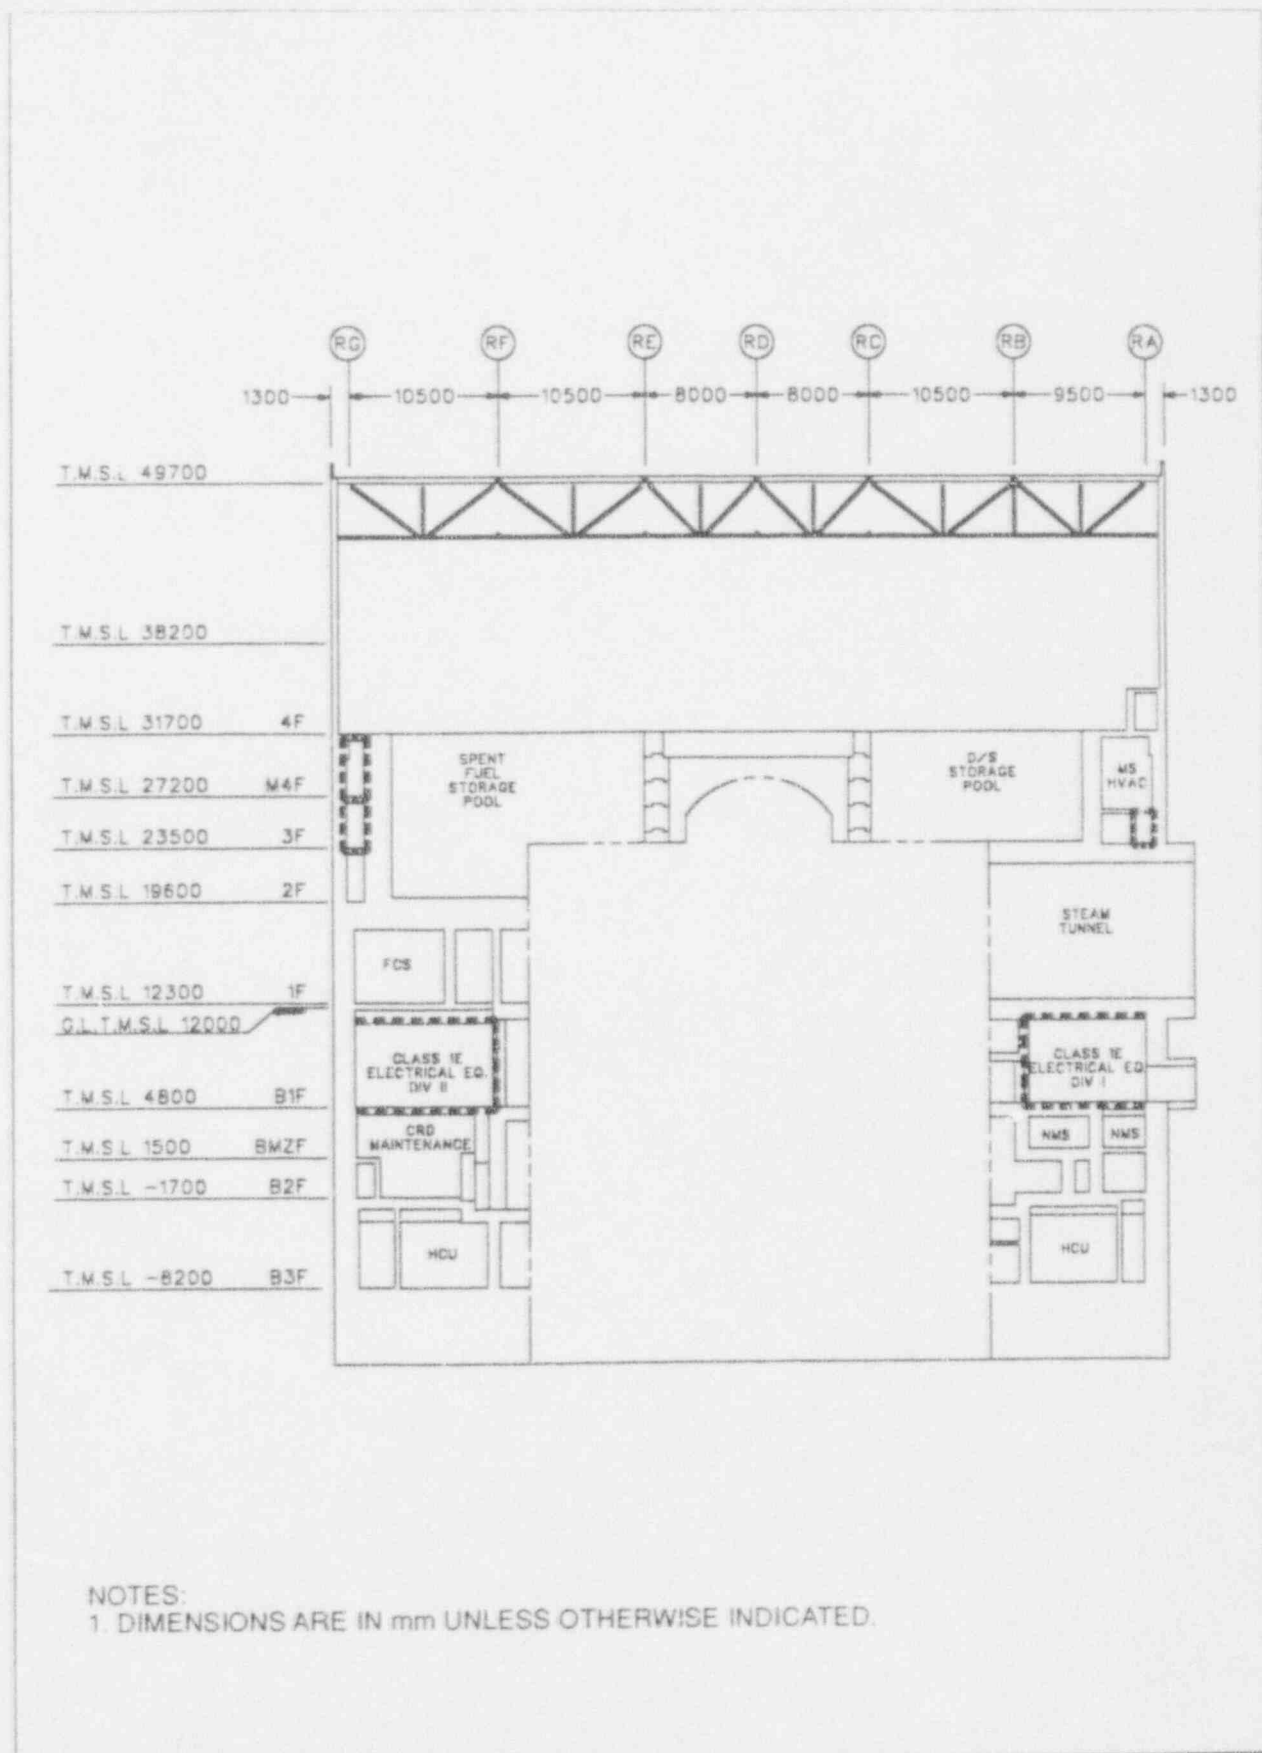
Reactor Building Arrangement—Section A-A
